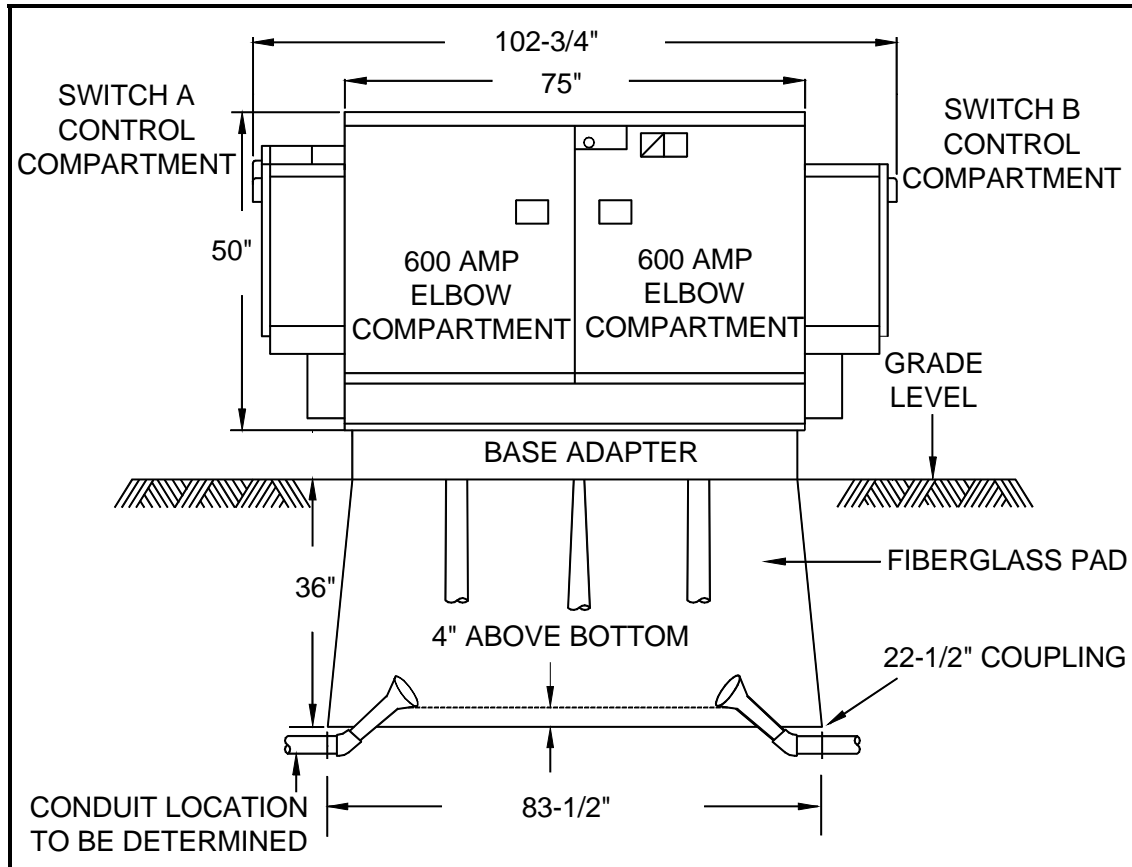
Typical 15kV, S&C Switch Mounted on Pad (600 Amp Elbow Side) - Front View (Motor Operated Switch Shown with base adapter)
